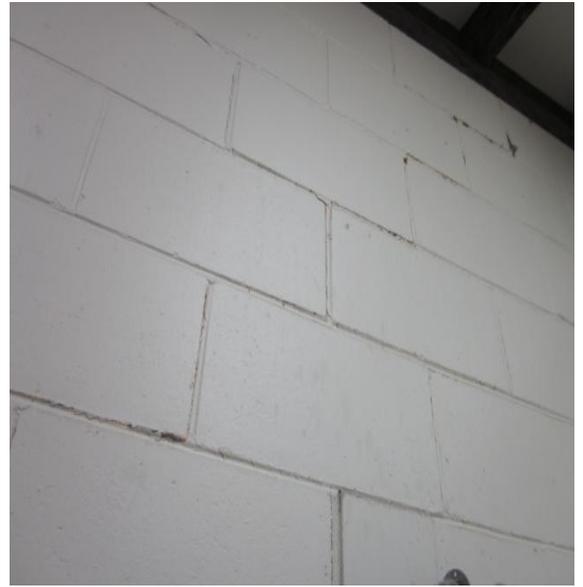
Typical hairline cracking in the wall dividing the men's and women's toilet
